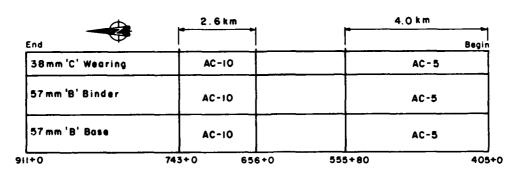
Pavement structure of test sections in Houlton, Maine (Pilsbury and Rand 1985).
